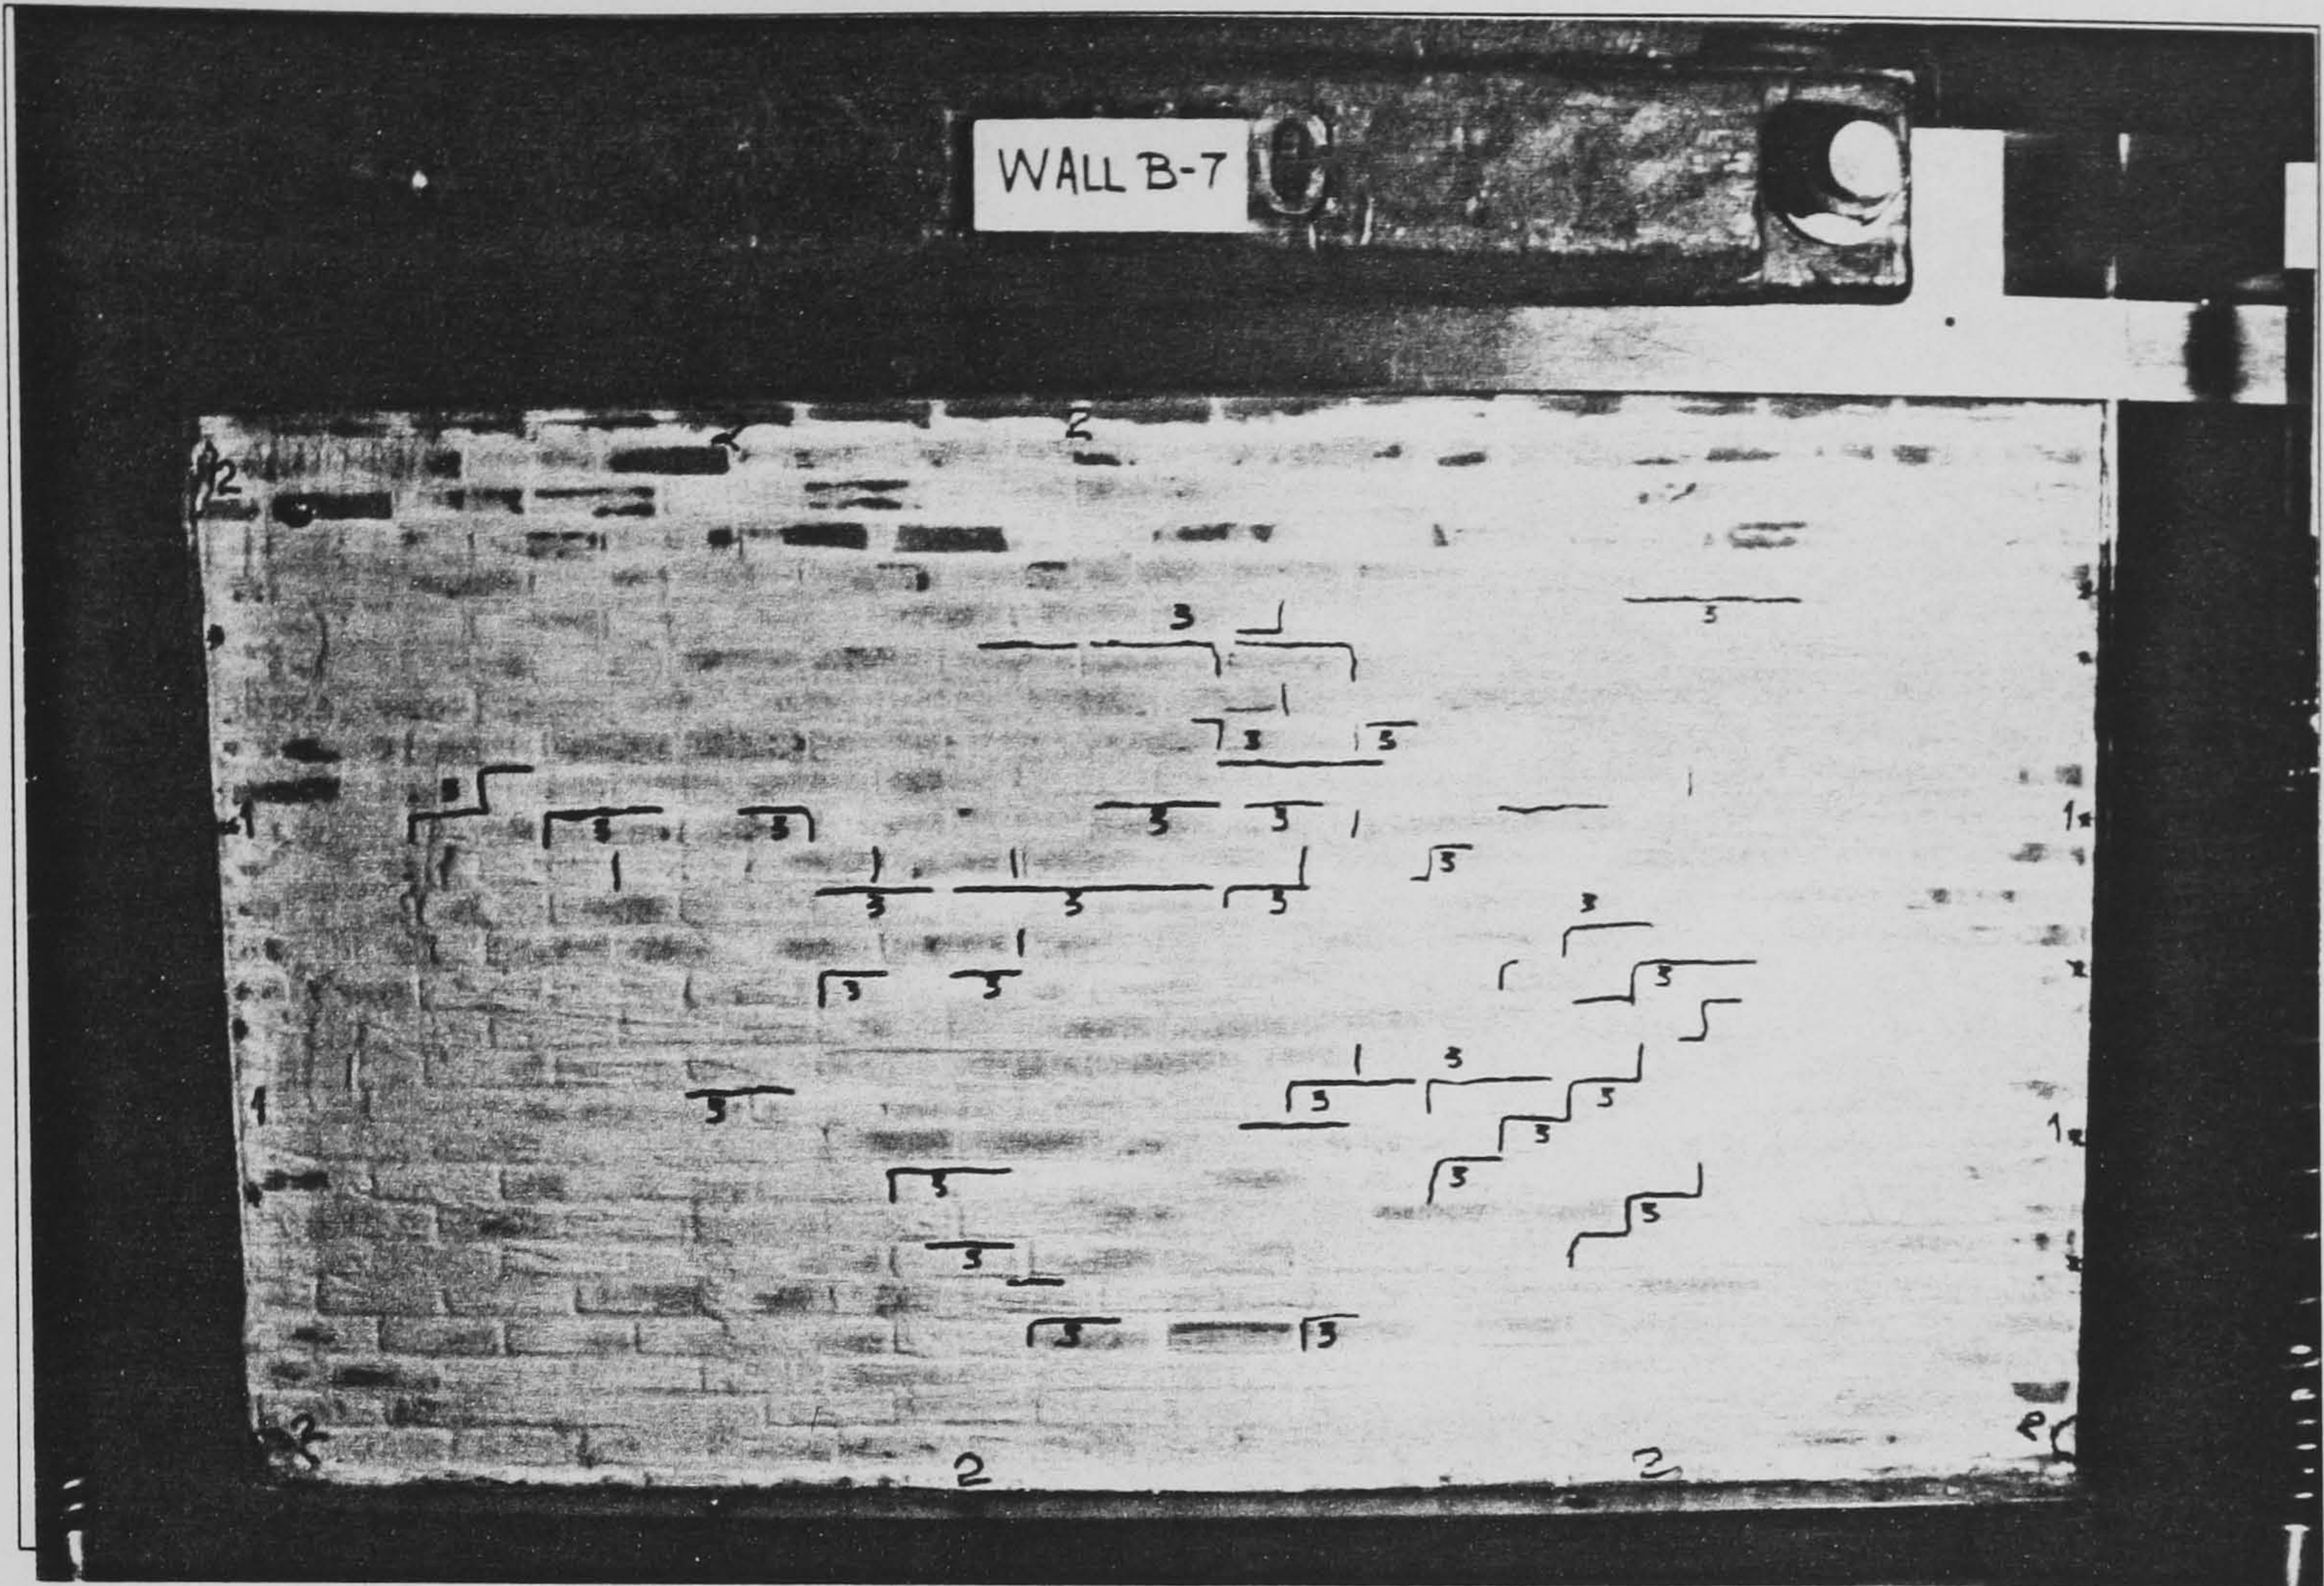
Cracking at 0.48g ground acceleration (wall-B)
